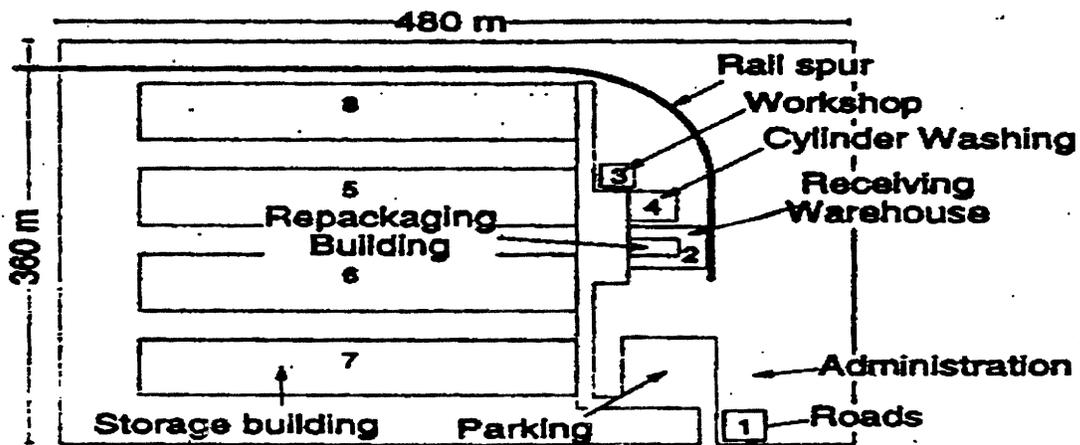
Site Layout UF₆ Building Storage Facility - 50% Capacity
